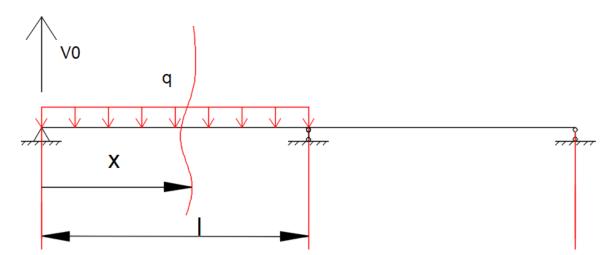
Static scheme for the case of a two-span beam with a distributed load of 1 span of the beam for 1 span
